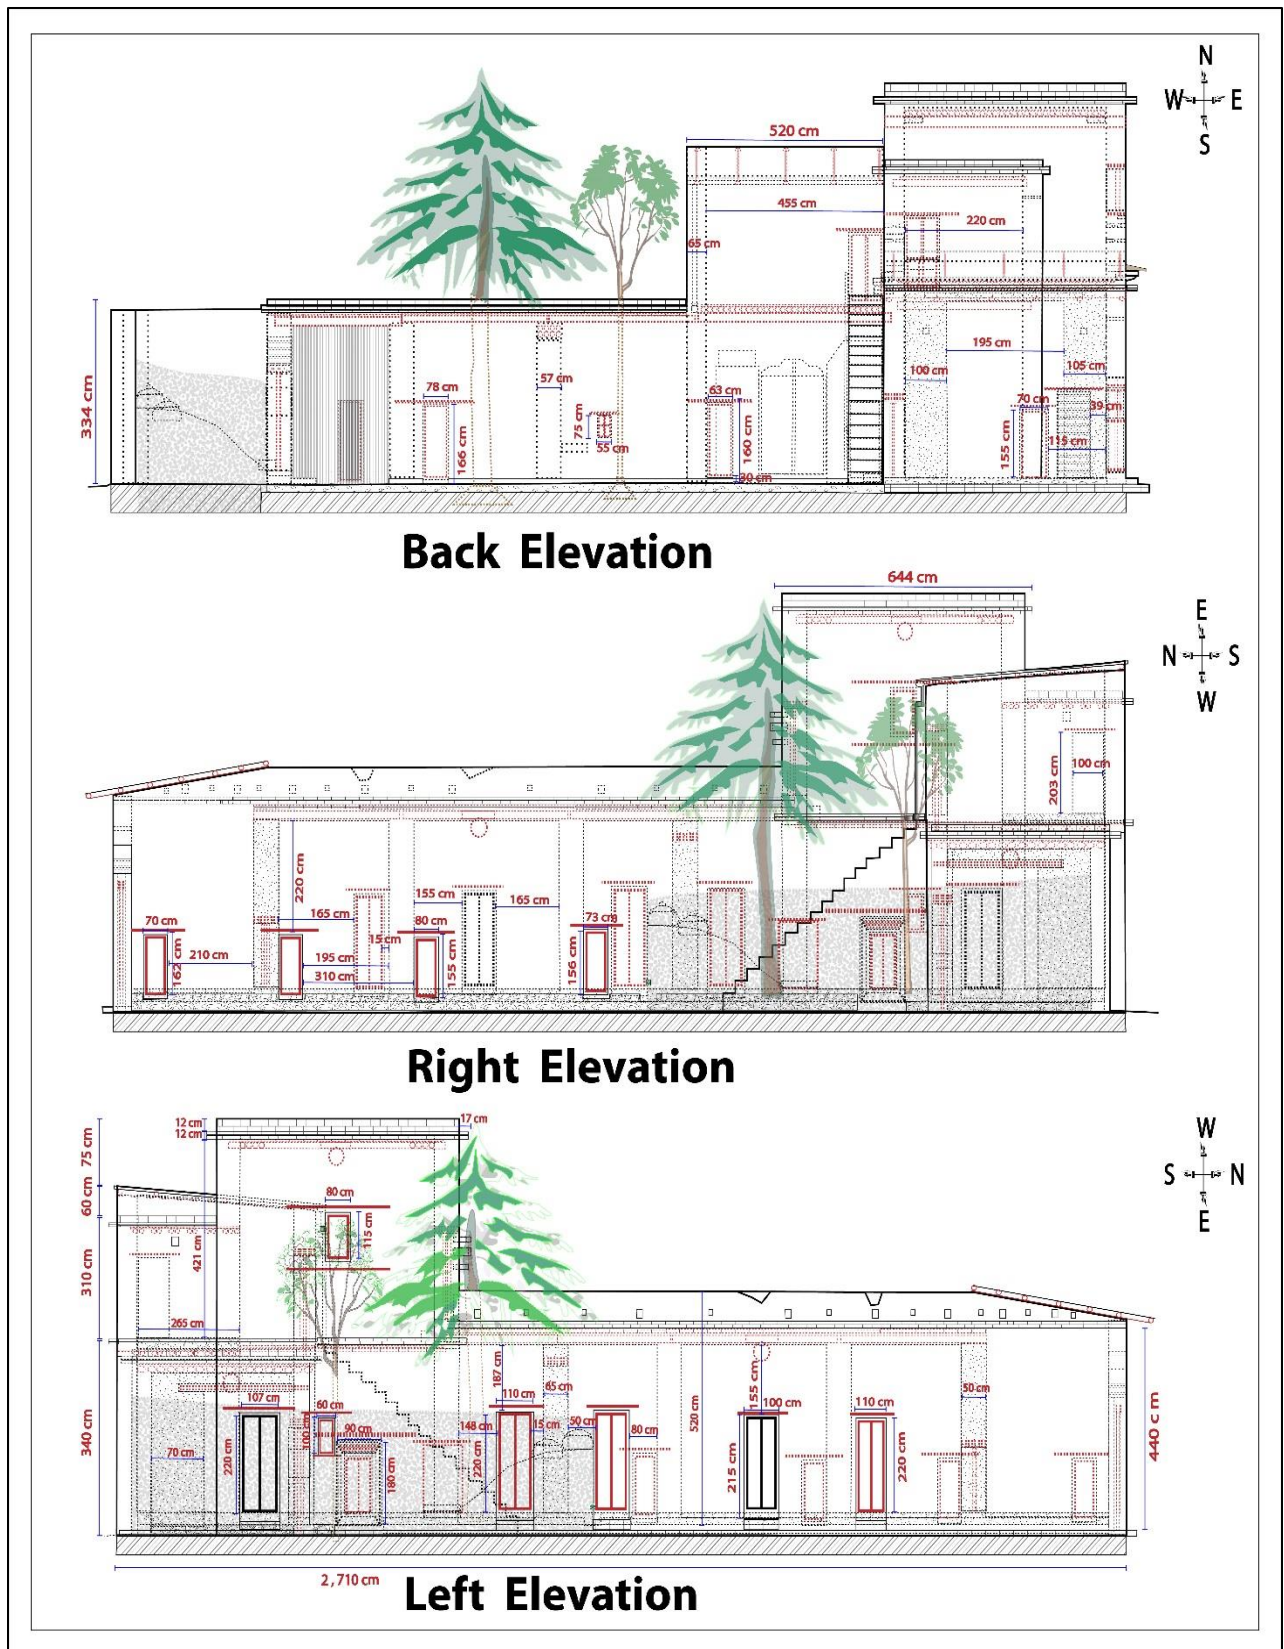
Rear, Right and Left View of Blata Tsegay Hidmo House. Made Using Adobe Illustrator, 2020.
